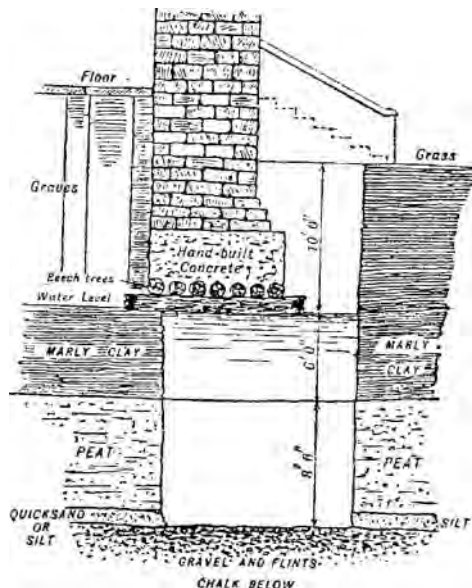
Section through wall of Presbytery, showing underlying soil profile (Henderson & Crook 2004).
